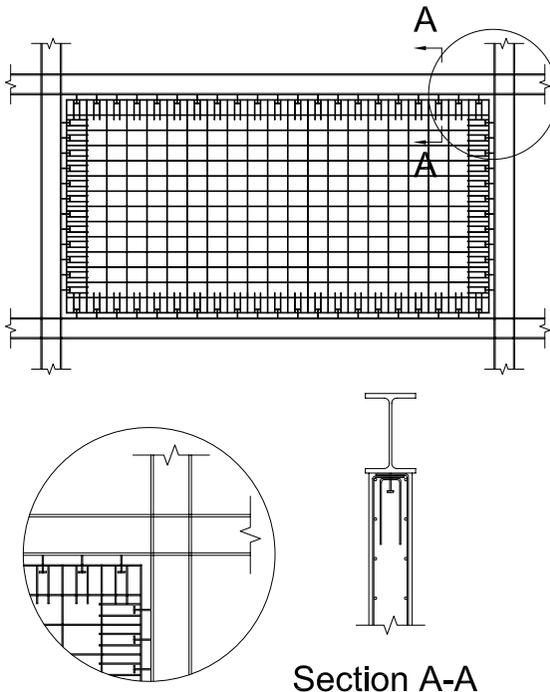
Typical reinforcement detailing in a composite wall for steel headed stud anchors subjected to tension.
